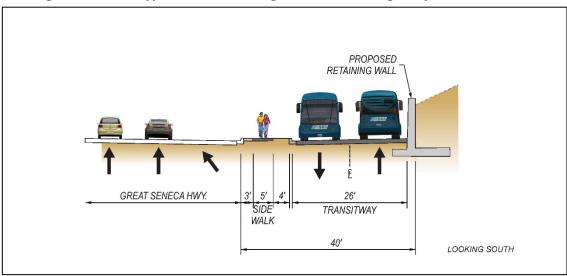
CCT Typical Section Along Great Seneca Highway
